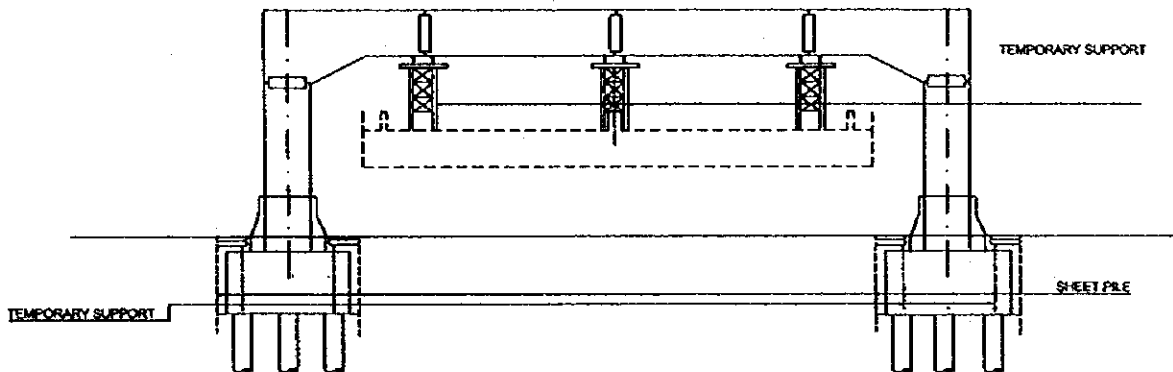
Inner Ring Expressway – Steel Pier and Beam
